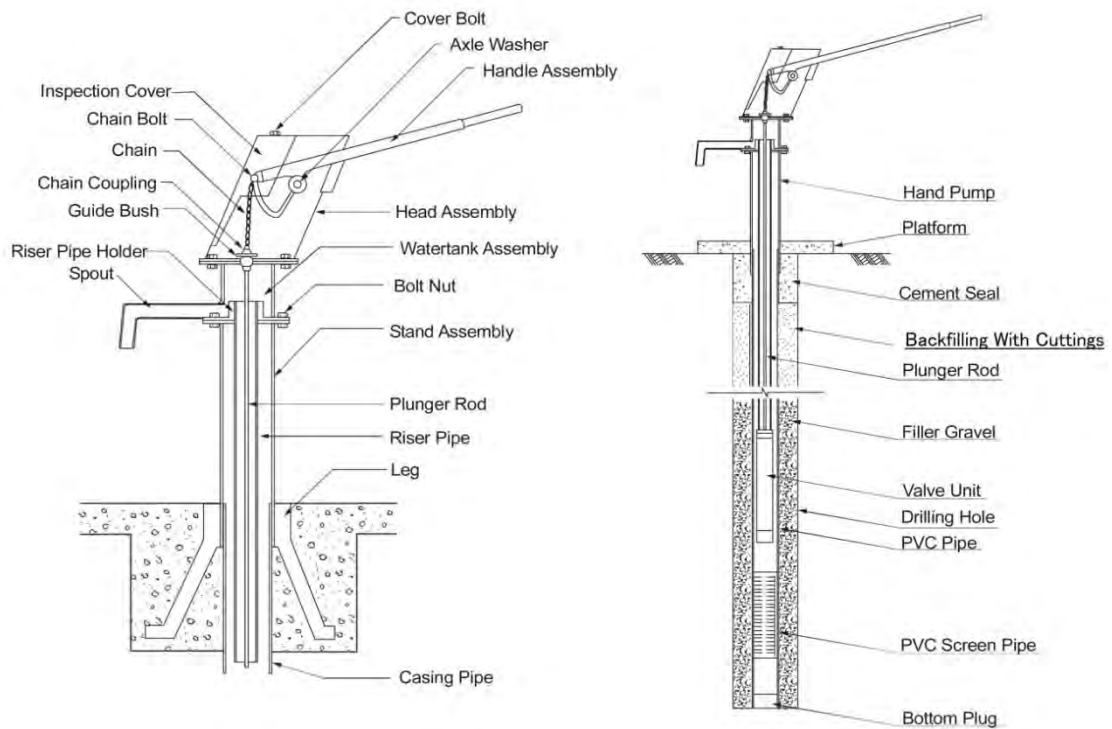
Hand Pump Structure (U-2 Type)
